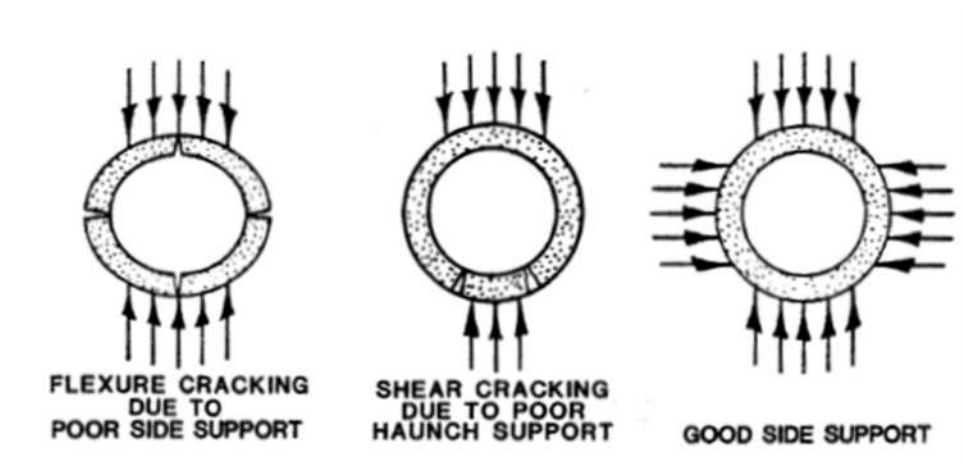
Longitudinal Cracks in Pipe Culvert
